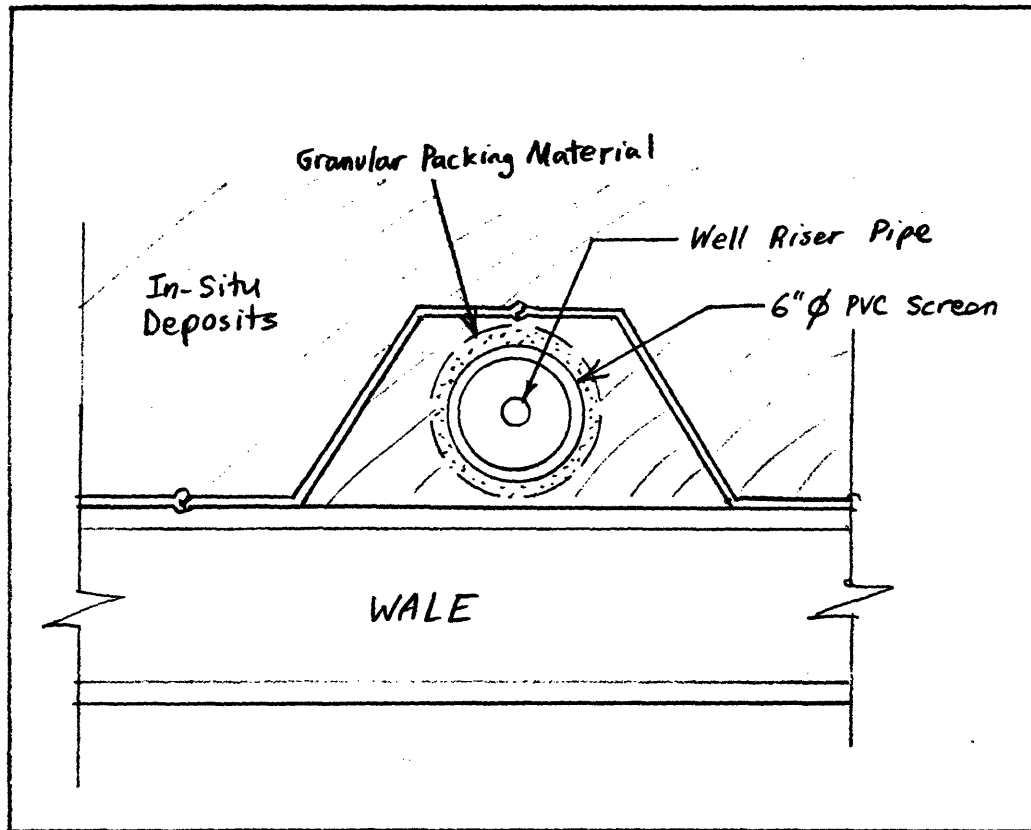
Plan View of a Typical Dewatering and Pressure Relief Well, Showing its Placement Relative to the Sheet piling and Wale (Contractor's Geotechnical Consultant, 1992b).
